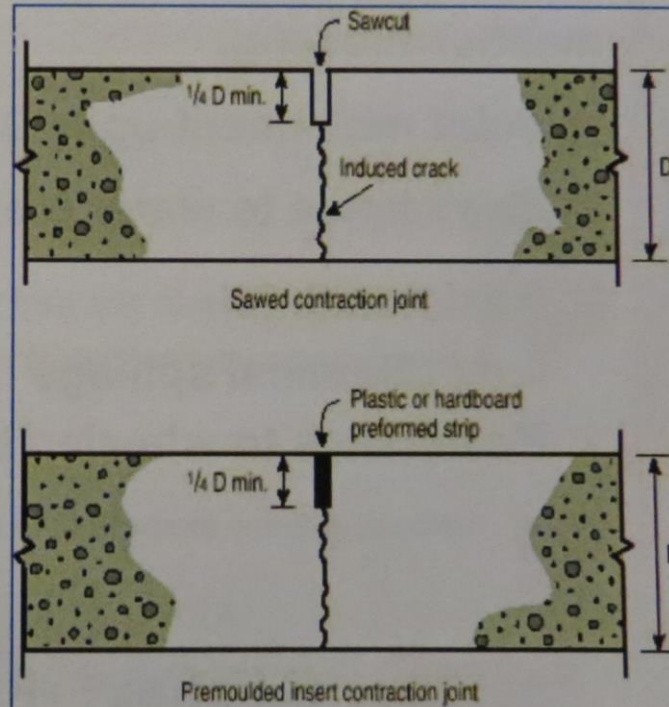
Contraction joints provide for horizontal movement in the plane of a slab or wall and induce controlled cracking caused by drying and thermal shrinkage.
